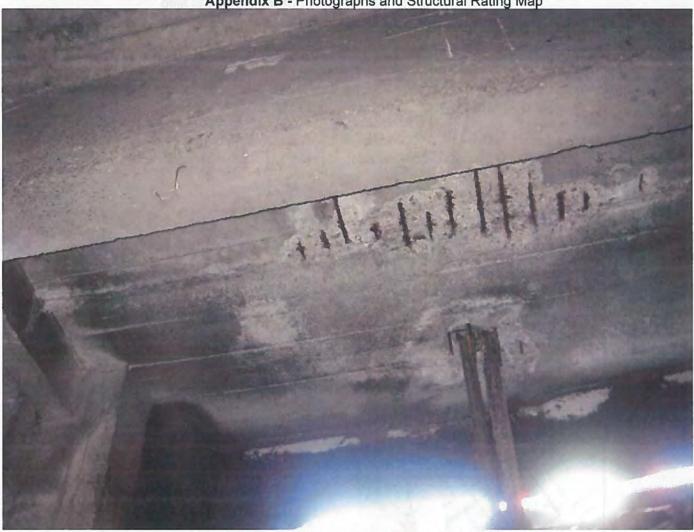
Spalling and corroded/exosed rebar at slab
